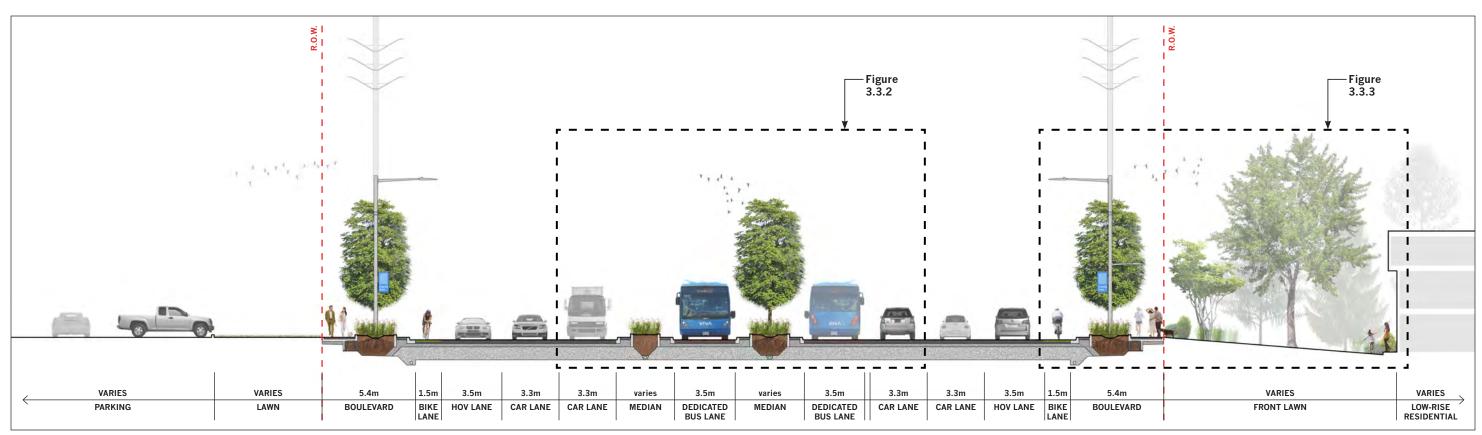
Highway 7 streetscape concept section [Existing land use].
